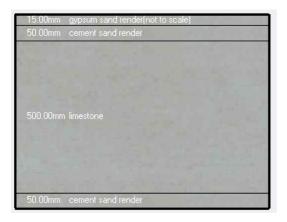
Wall layers (3rd floor) DesignBuilder figure
